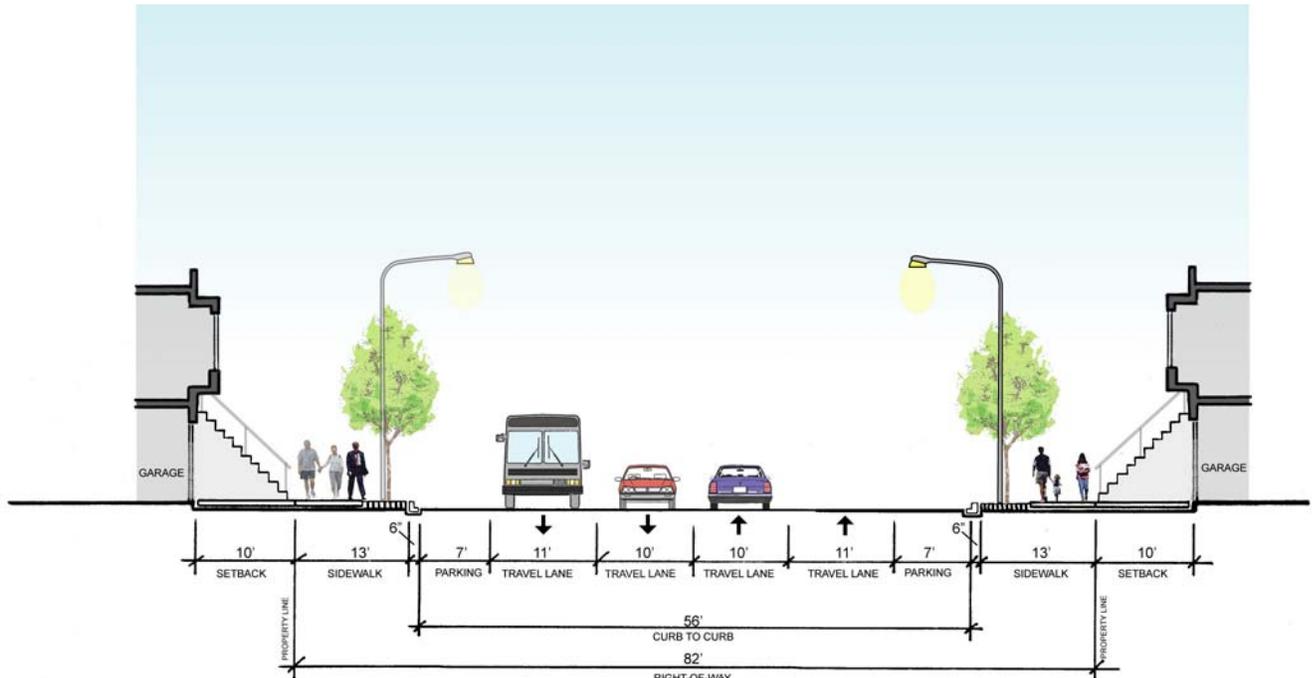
Option C calls for eliminating existing painted median and widening sidewalks on Geneva Avenue, with new street trees, between Alemany Boulevard and San Jose Avenue.
